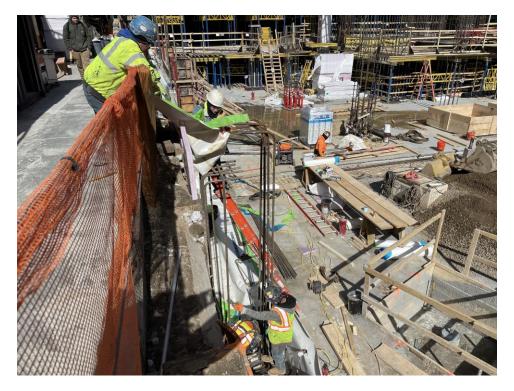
ECD applying waterproofing to the foundation wall in the western part of the site (facing northeast).
